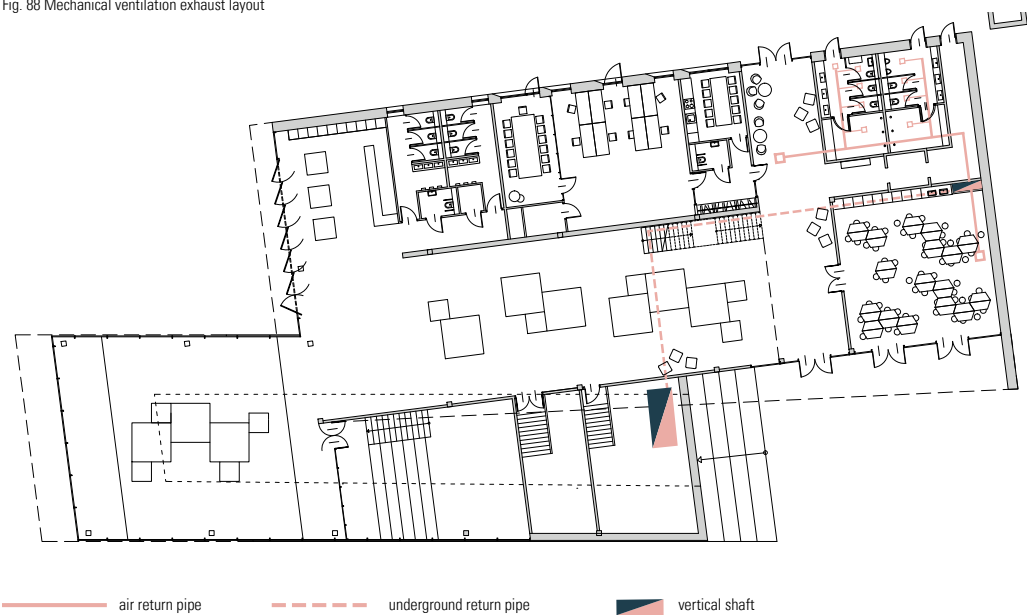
Mechanical ventilation exhaust layout - ground floor
